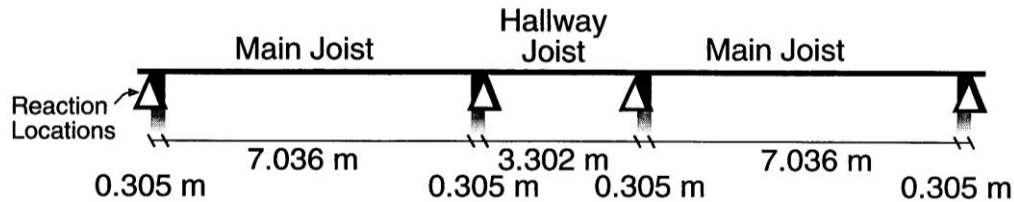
Layout of OWSJs as Modeled in Wind Tunnel Tests.
